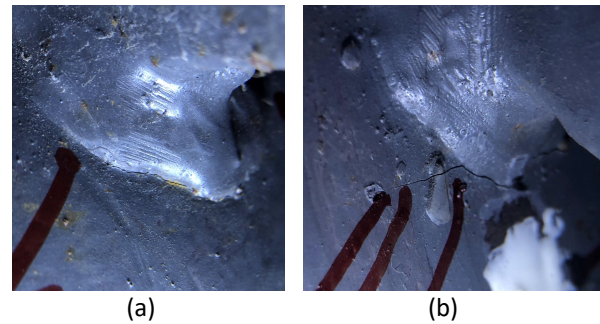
Fatigue cracks of U_w-rib-to-middle-crossbeam weld: (a) vertical crack; (b) longitudinal crack.
